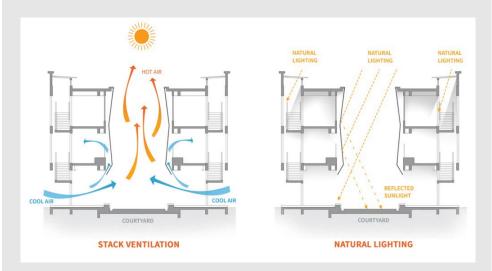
Internal courtyards on the lowest floor (Source: Author)
